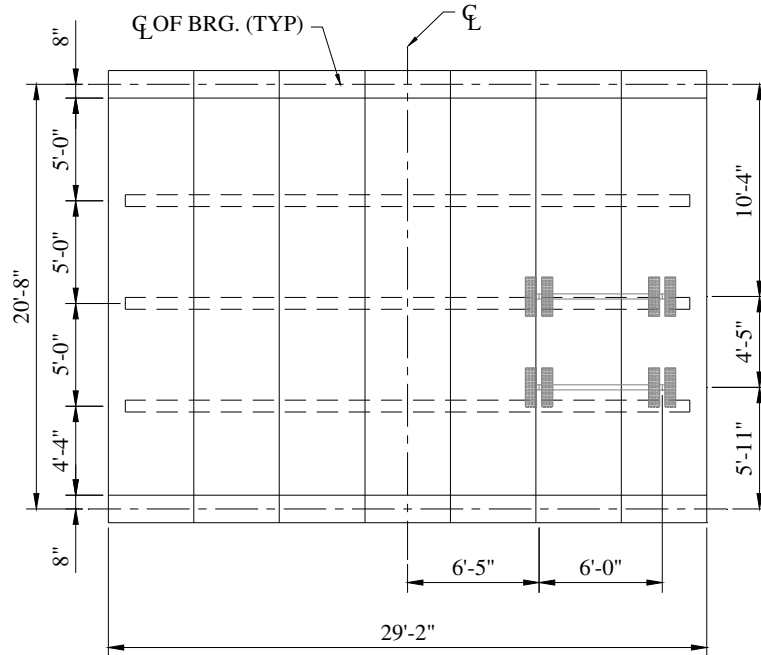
Controlling Load Position for Scio Bridge, Plan View
